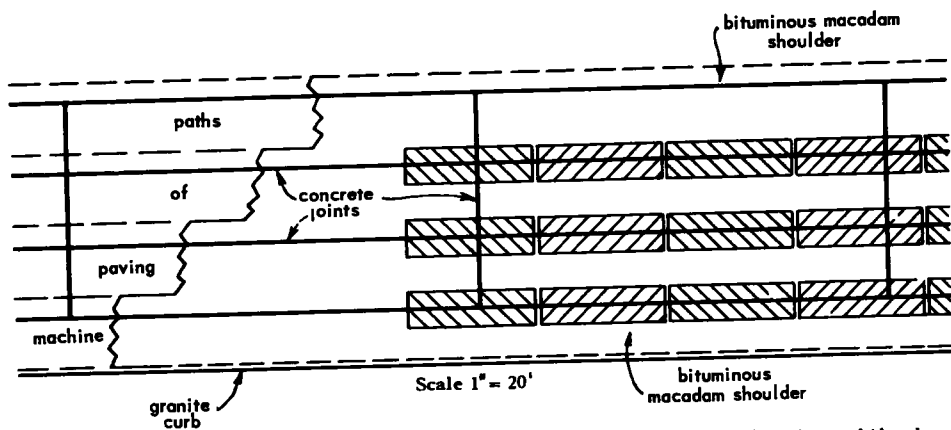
Placement of fabric on road. Longitudinal joint reinforcing with sheet fabric.
